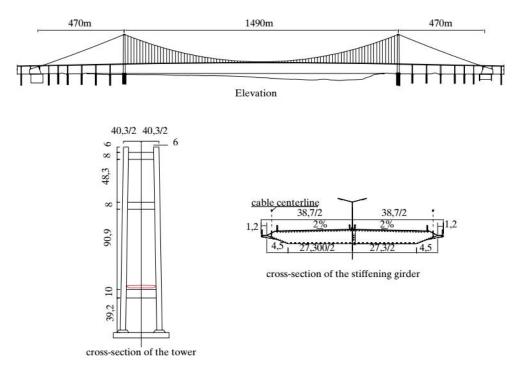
General layout of the Runyang Highway Bridge over the Yangtze River
